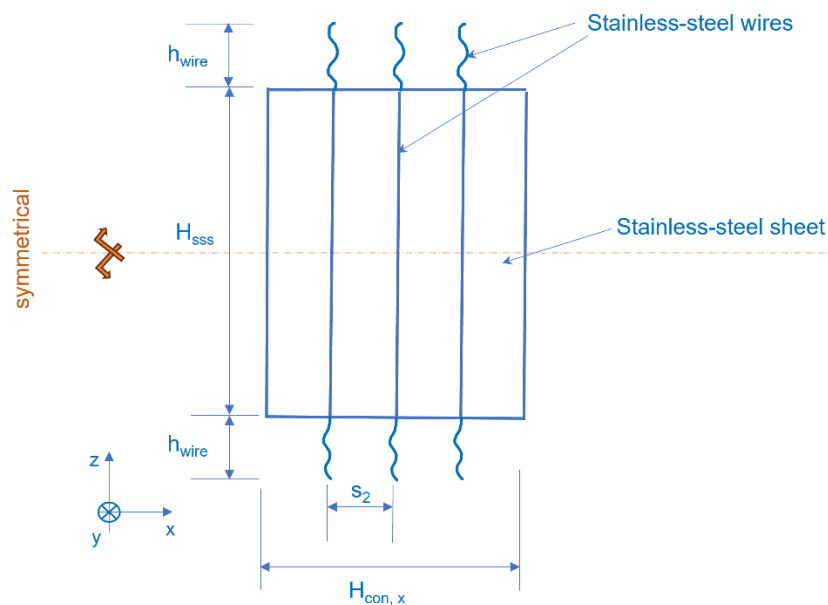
Stainless-steel point connector for sandwich walls – schematical example with 3 stainless-steel wires showing symmetry in z-direction
